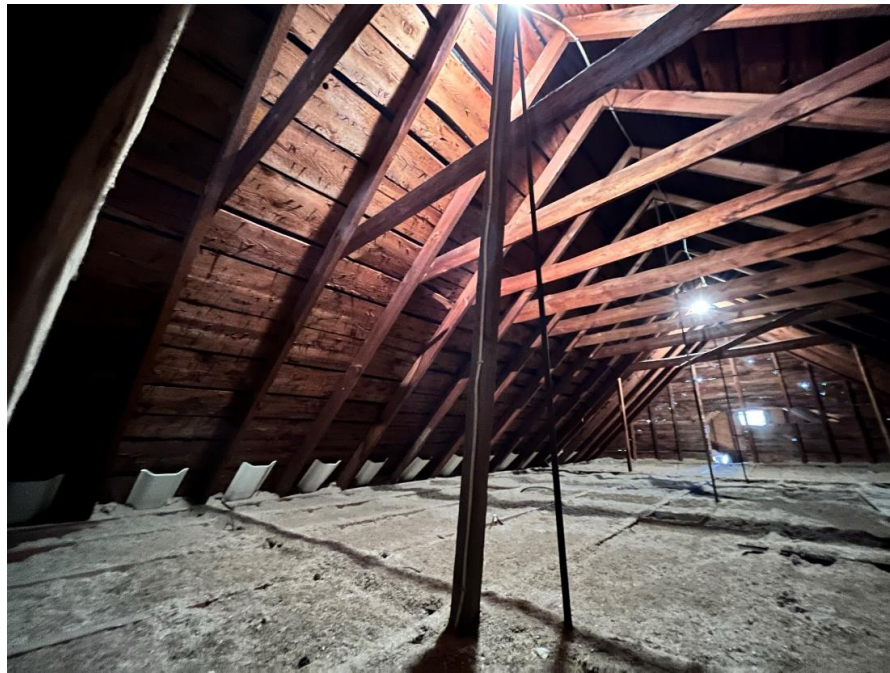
Attic rafters and wide pine sheathing with dropped ceiling supports in main section. Note insulation on ceiling and baffles along the walls.
